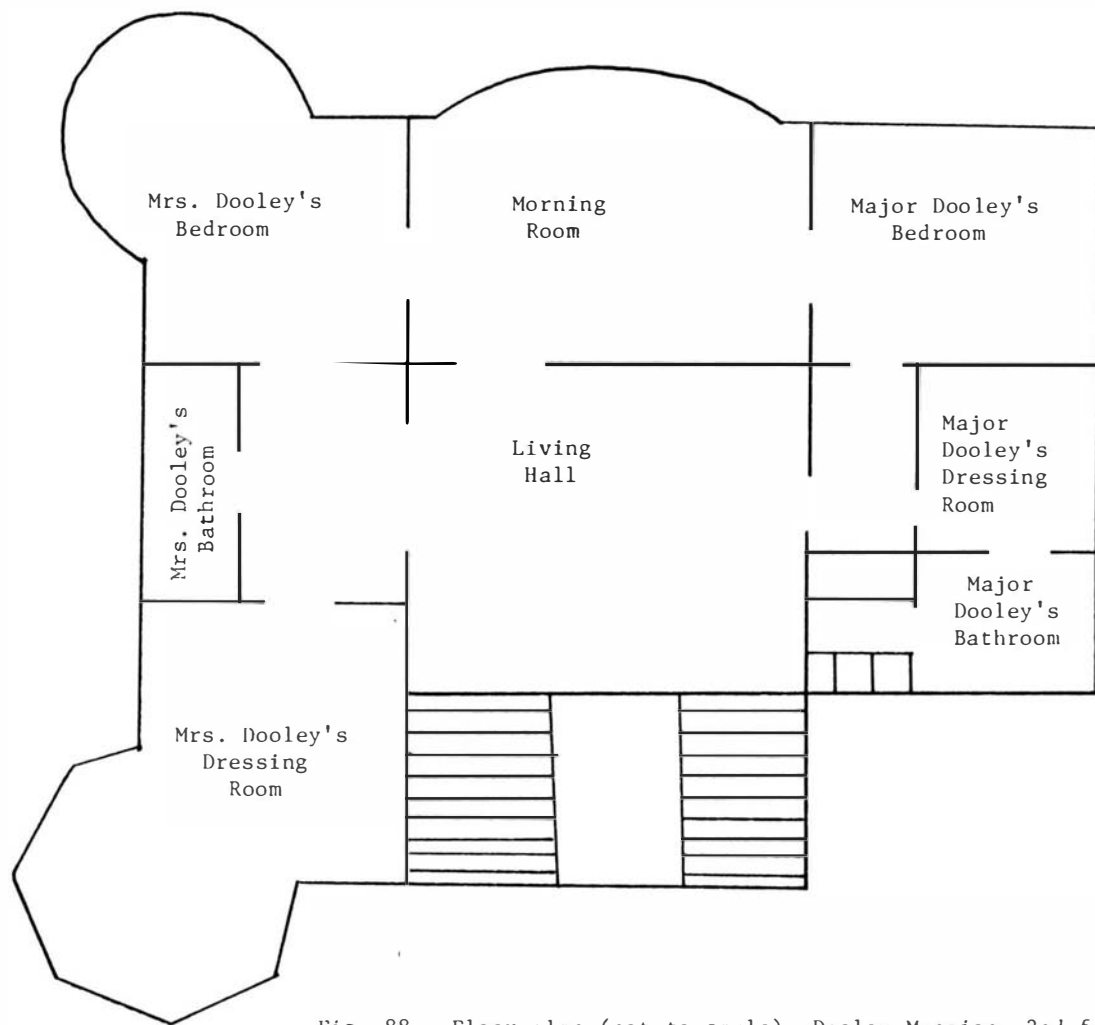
Floor plan (not to scale), Dooley Mansion, 2nd floor
